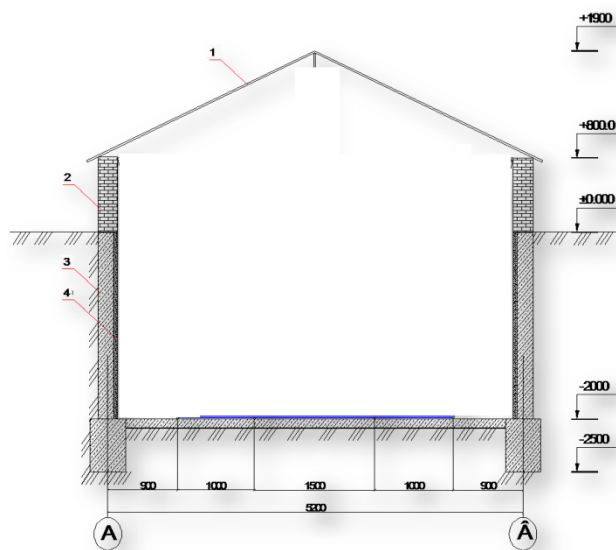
Underground greenhouse-thermos. 1-polycarbonate, 2-brick, 3-reinforced concrete wall, 4-light reflective material.
